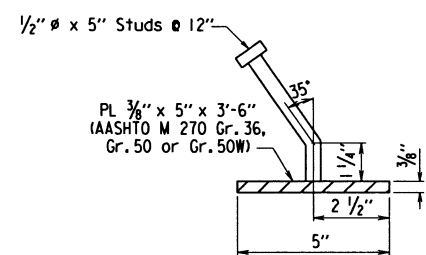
DETAILS OF OPTIONAL SLIPFORMING OF CONCRETE PARAPET RAIL
